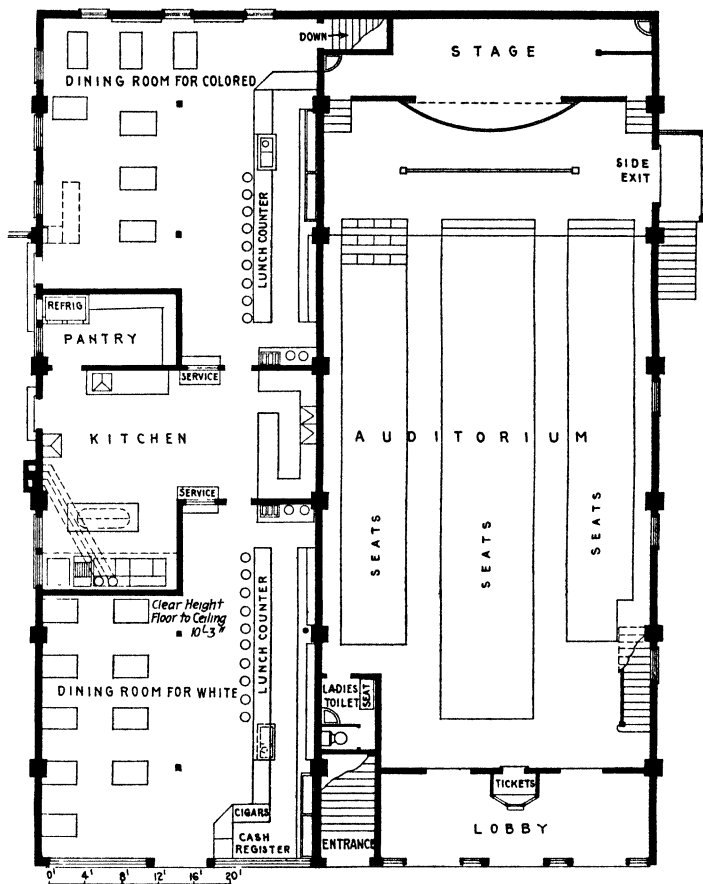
FIRST FLOOR OF COMMUNITY BUILDING.
